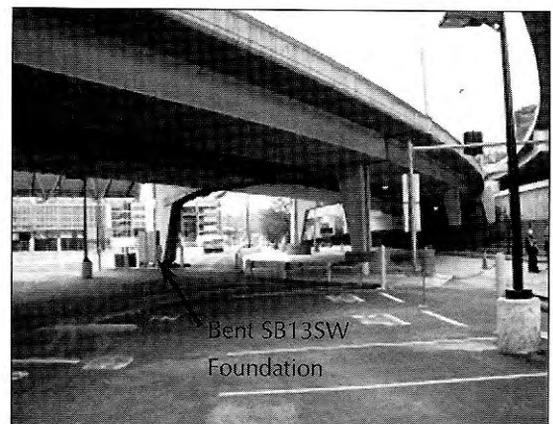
SR 0065 supports requiring underpinning — Bent 13 underpinning carries the Bent SB13SW foundation only.
